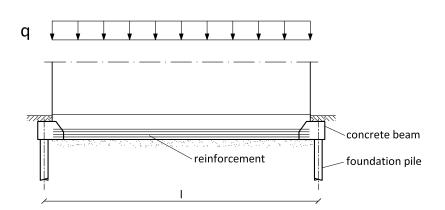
Side view of reinforced masonry wall (by author)
